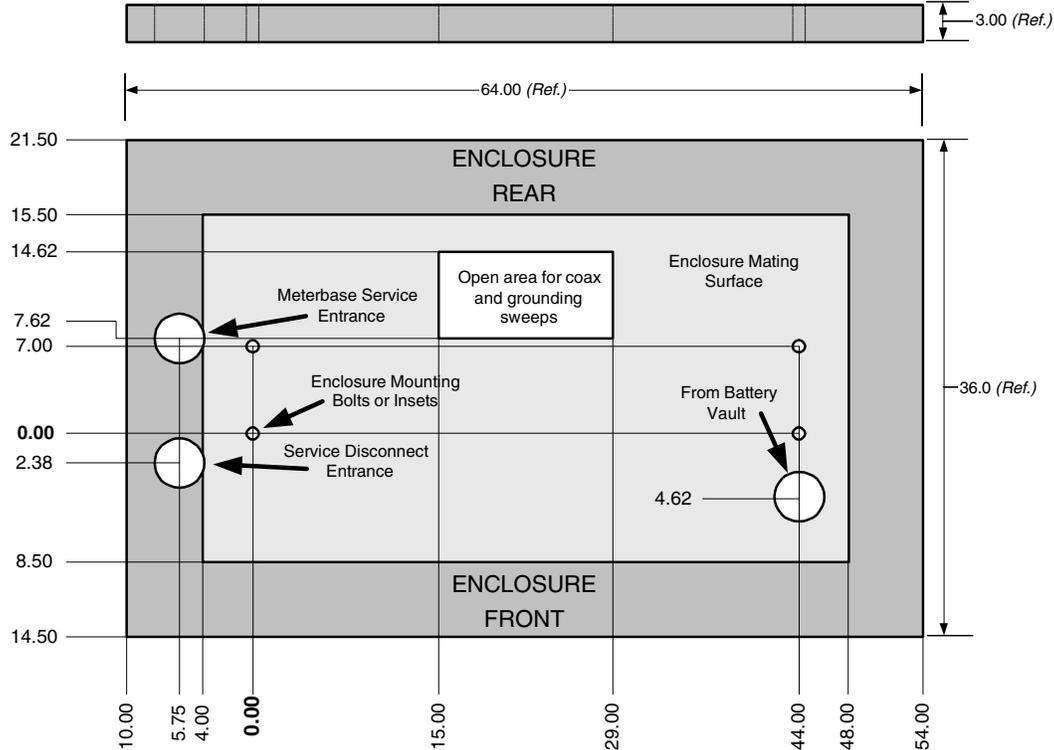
PN-6, Single-wide Cabinet Pad dimensions
